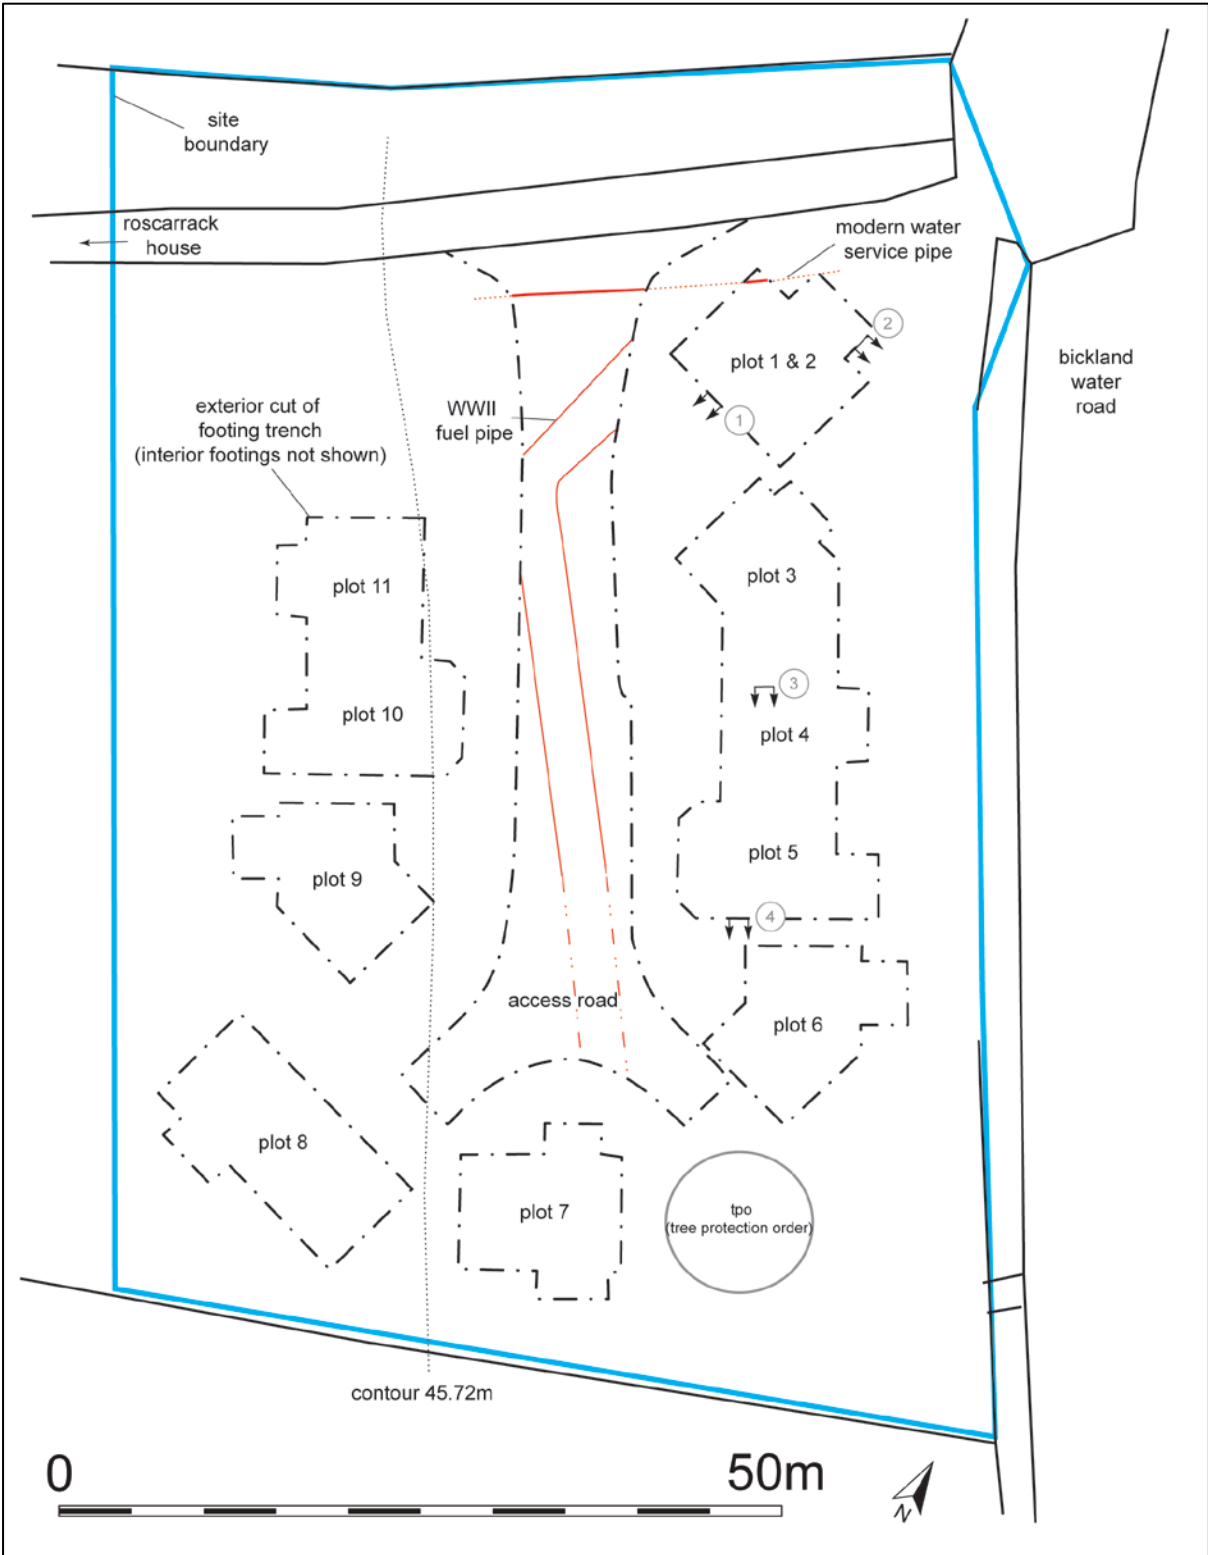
Site plan; grey-scale section numbers correspond to section numbers in Figure 7.
